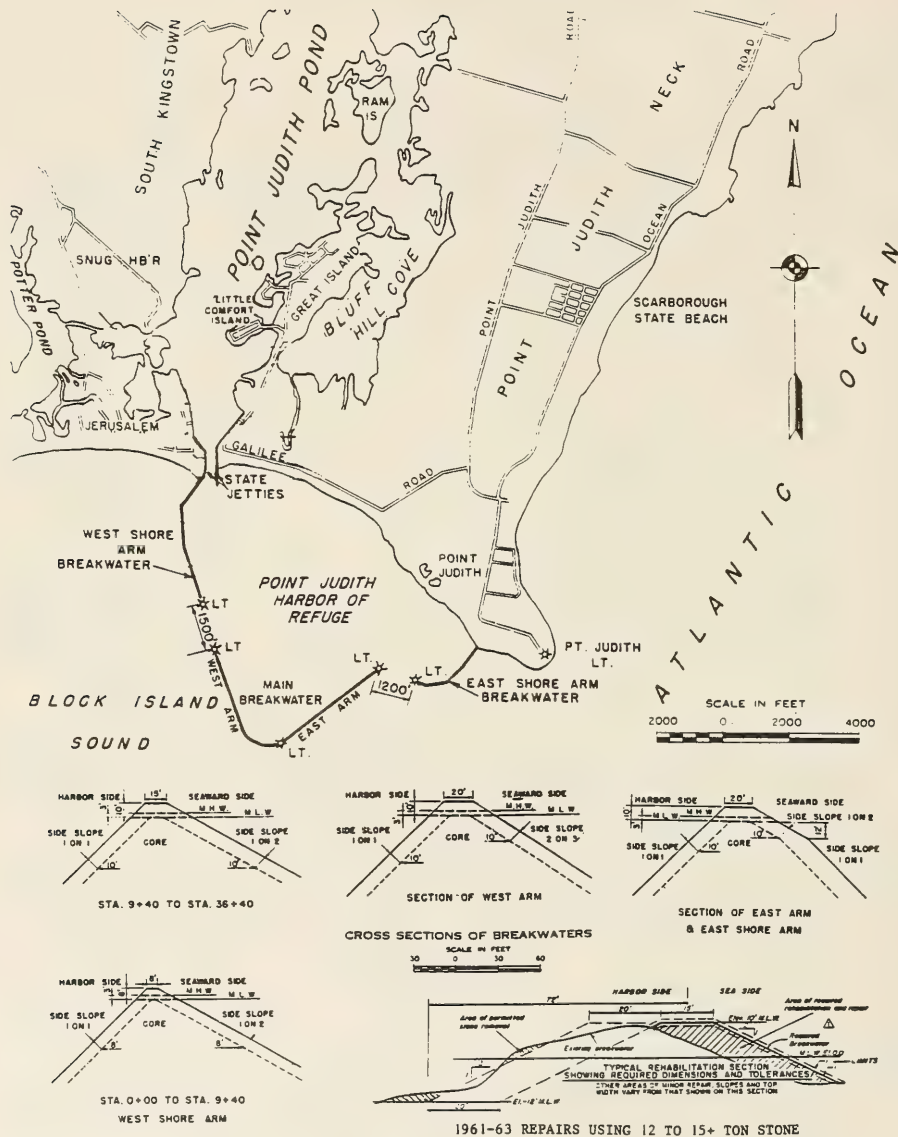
Plan view and typical sections of breakwaters at Point Judith Harbor of Refuge, R.I.
